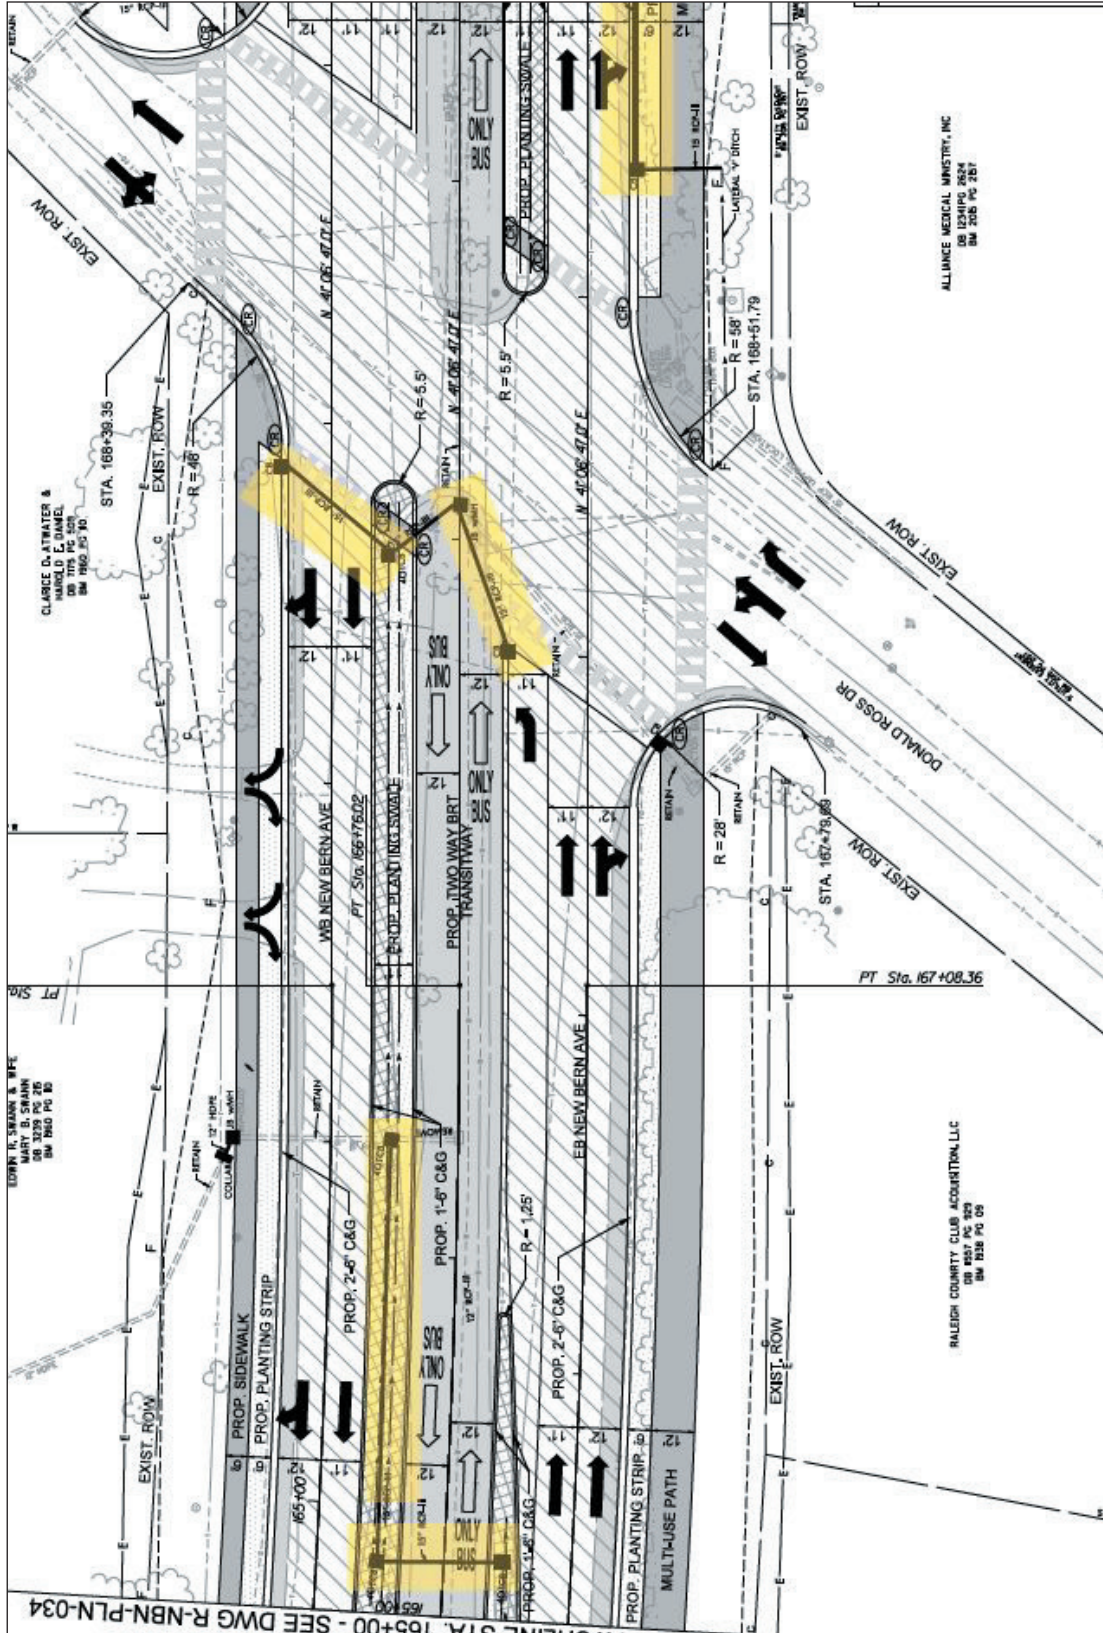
New Bern Avenue Improvements within Longview Gardens Historic District, Wake BRT New Bern Corridor Preliminary Plans, Sheet R-NBN-035, 2020
